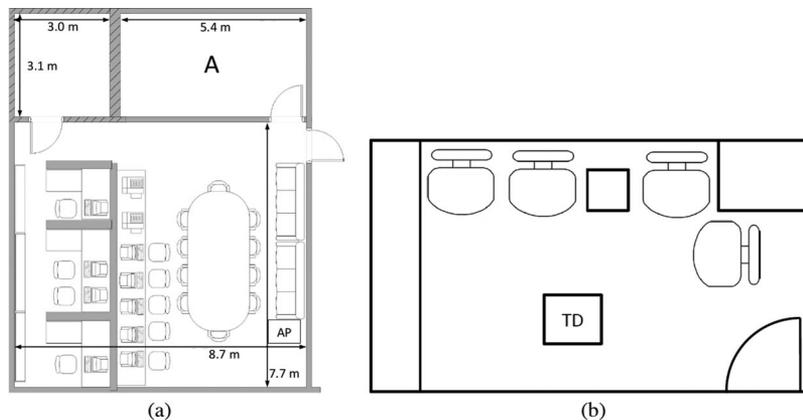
(a) Floor plan of the office room where we conduct our experiments. (b) Floor plan of room A.
